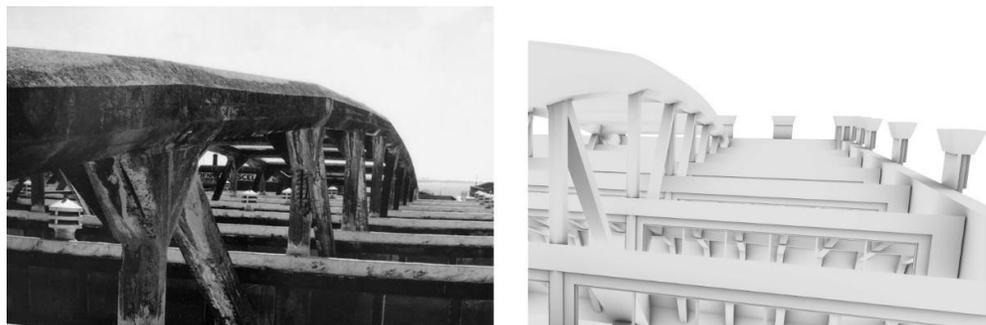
Left: The photo of the bow truss structure above the saw-tooth roof system. Right: The digital reconstructed model of the bow truss roof is modelled based on the reference of the previous photo.
